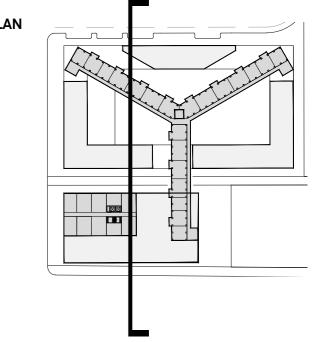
Building Setbacks - Horace Petty North West D Quadrant
